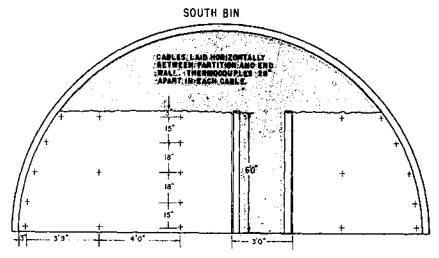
Cross-section of south bin of Quonset "20" building, showing location of thermocouple cables.
